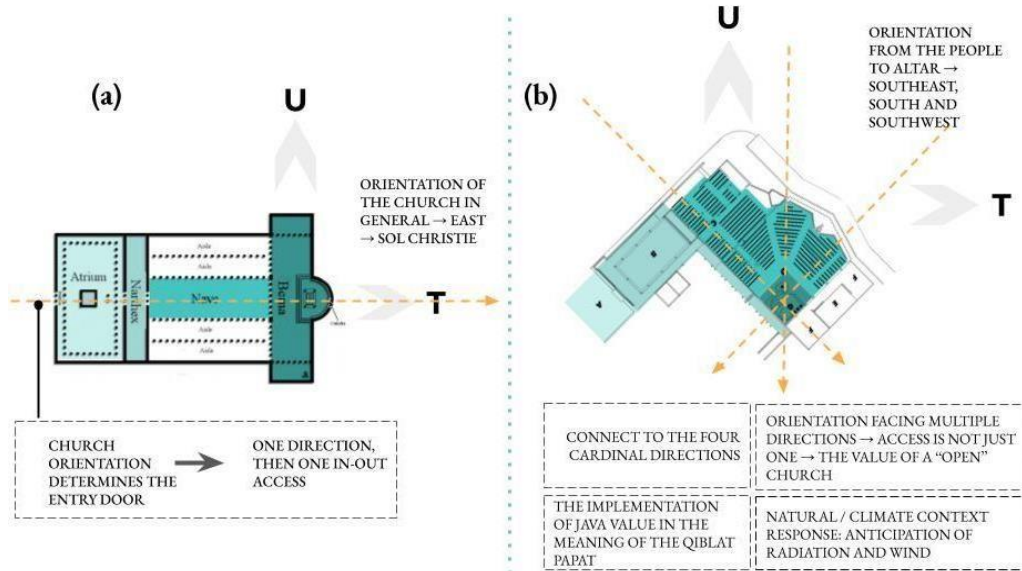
The Difference Between General Church Plan and Santa Maria Assumpta Church
